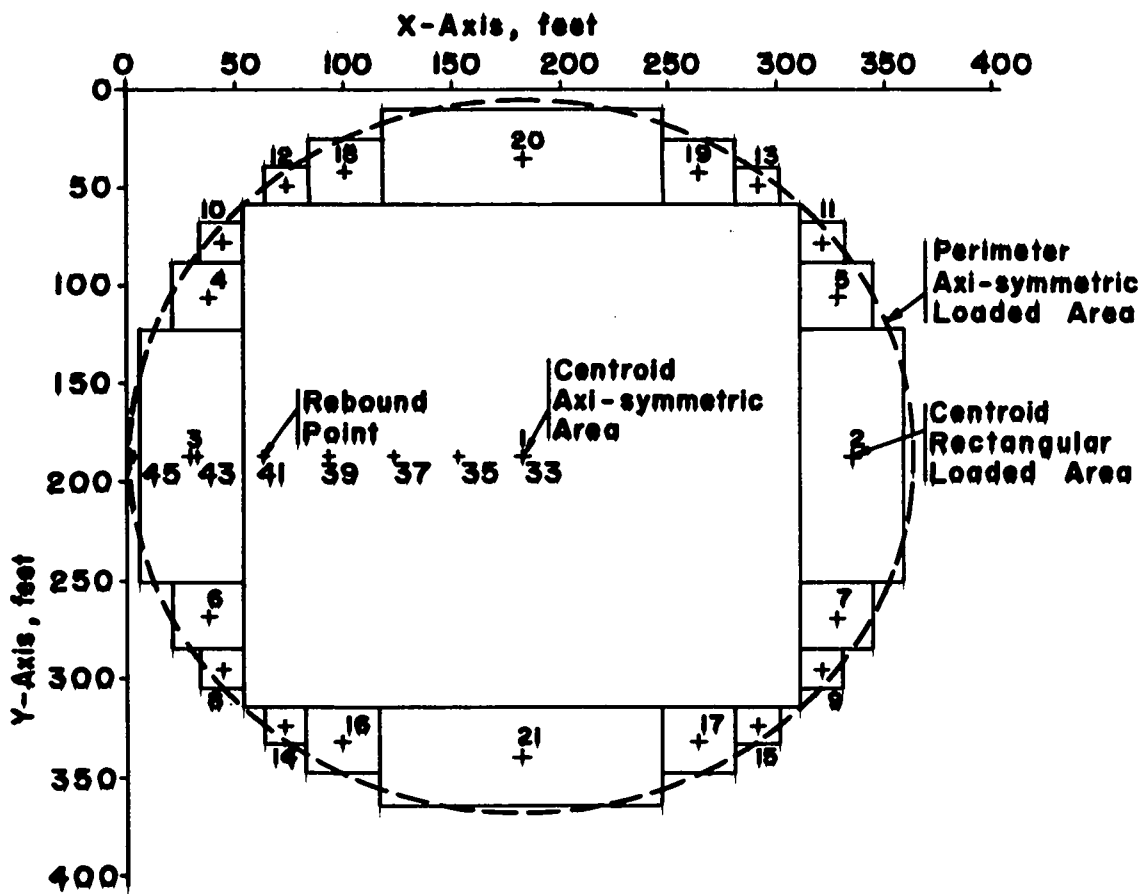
Axi-symmetric Excavation Plan in Terms of Multiple Rectangular Blocks
